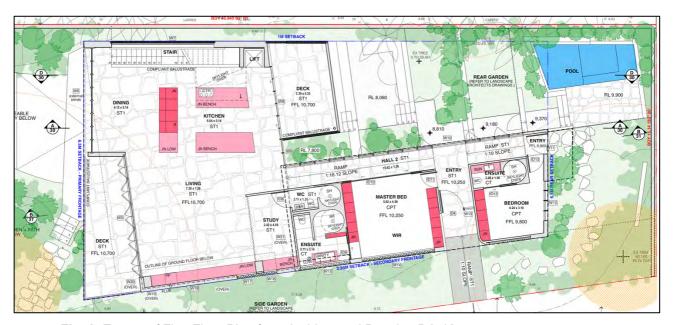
Extract of First Floor Plan from Architectural Drawing DA-12.
